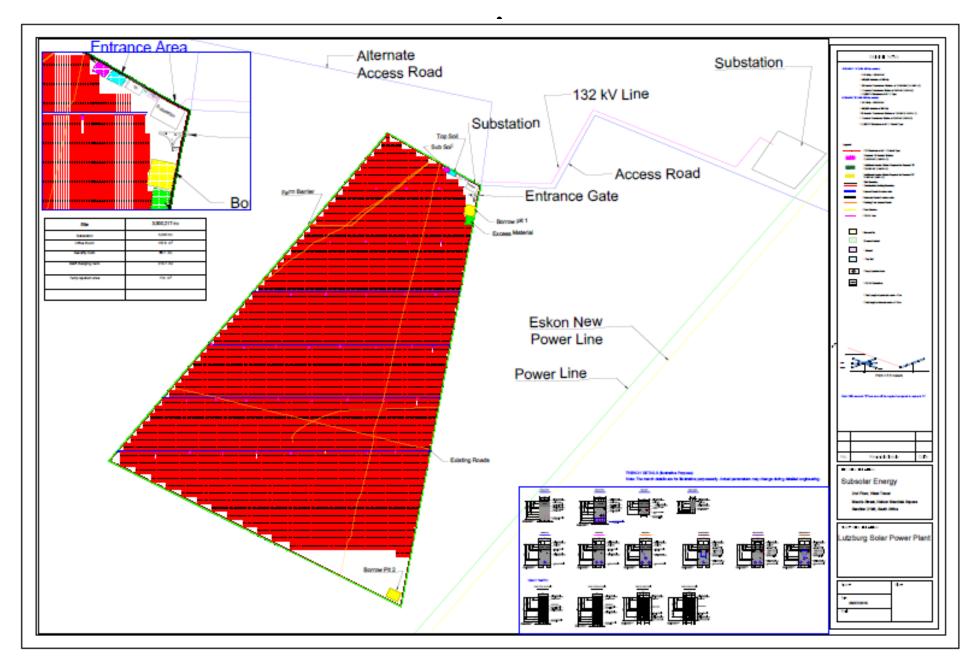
Layout plan indicating site boundary, plant boundary and internal roads.
